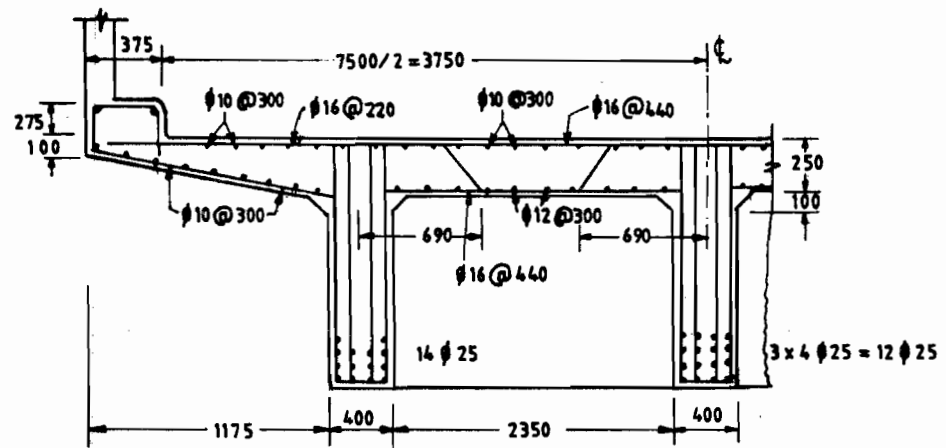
Reinforcement in Cross-section of T-Beam Bridge
